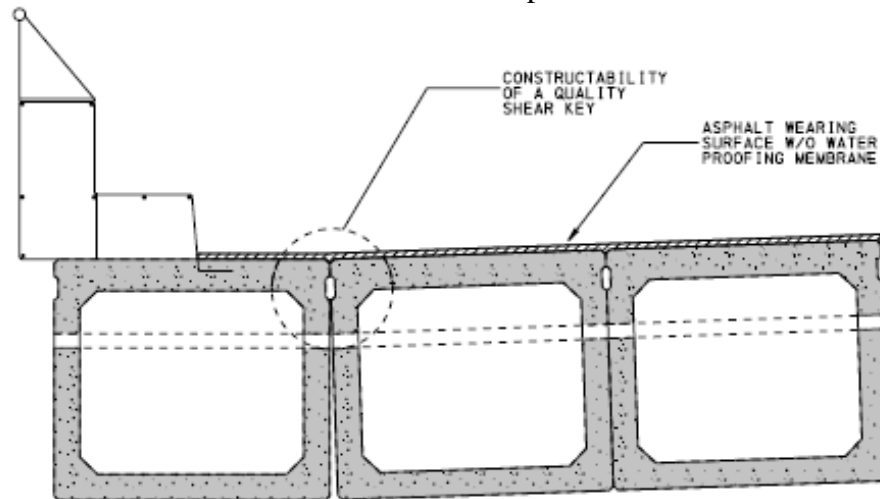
PennDOT 1st Generation Noncomposite Adjacent Prestressed Concrete Box Beam Bridge
